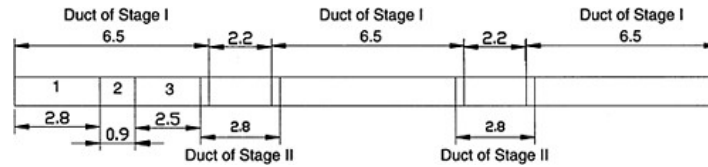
Typical Segmentation for Duct of 0+310~0+610 Impervious wall.
